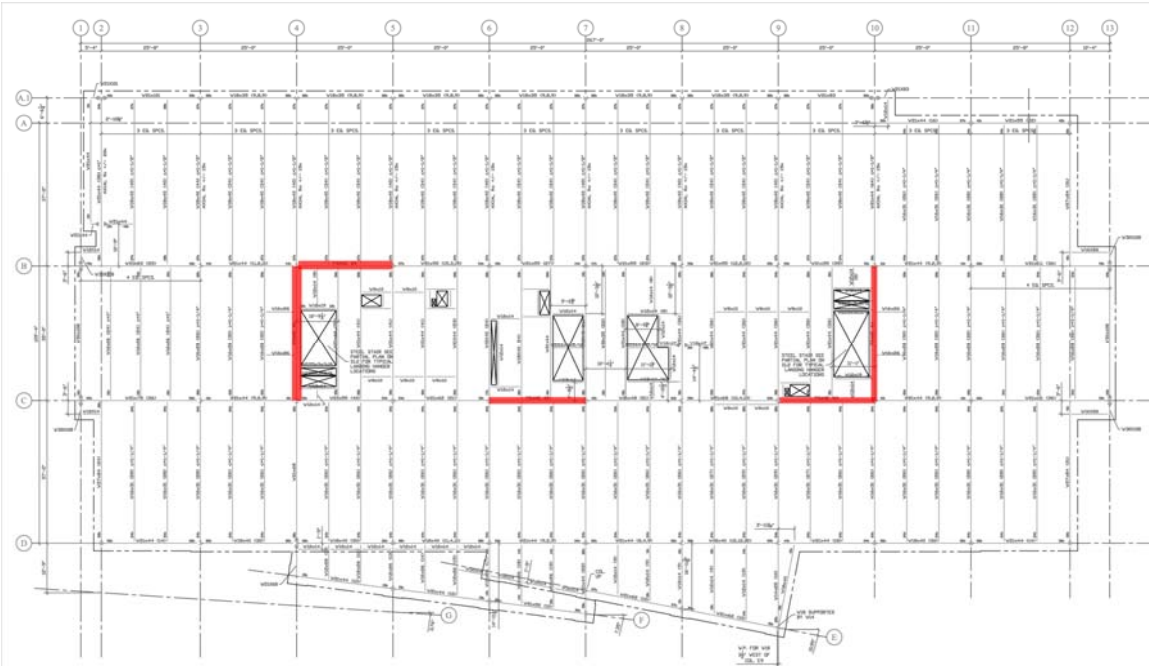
4<sup>th</sup> floor plan with highlighted frames
